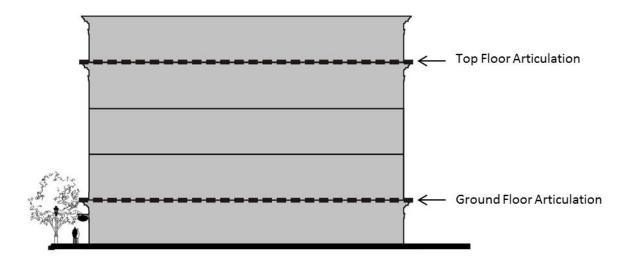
A.2: BUILDING HEIGHT ARTICULATION
